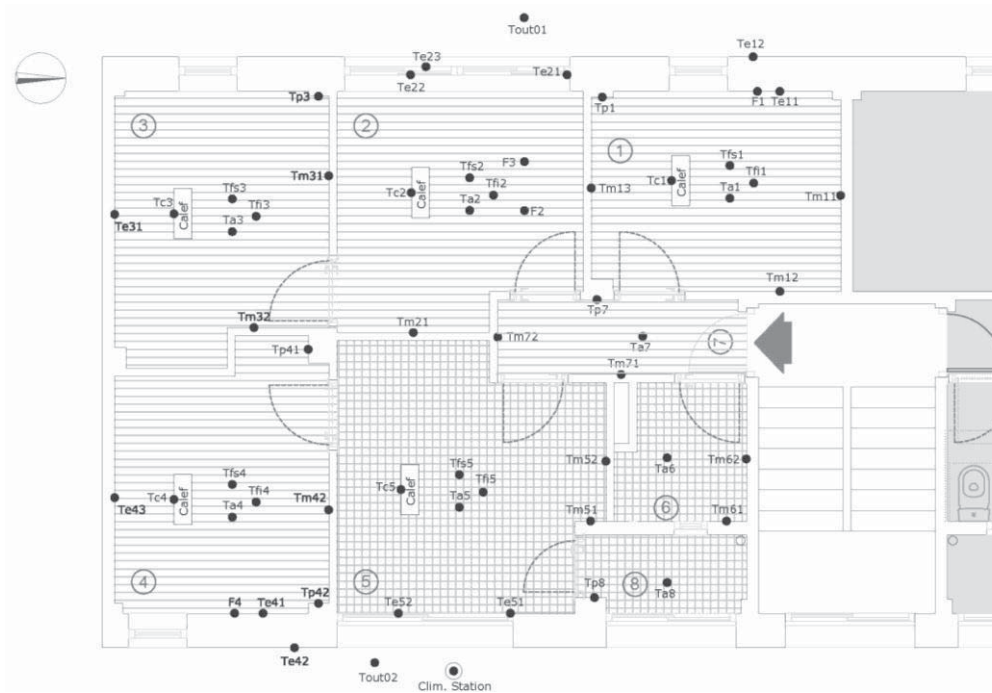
11. Layout of the studied dwelling before retrofitting works
